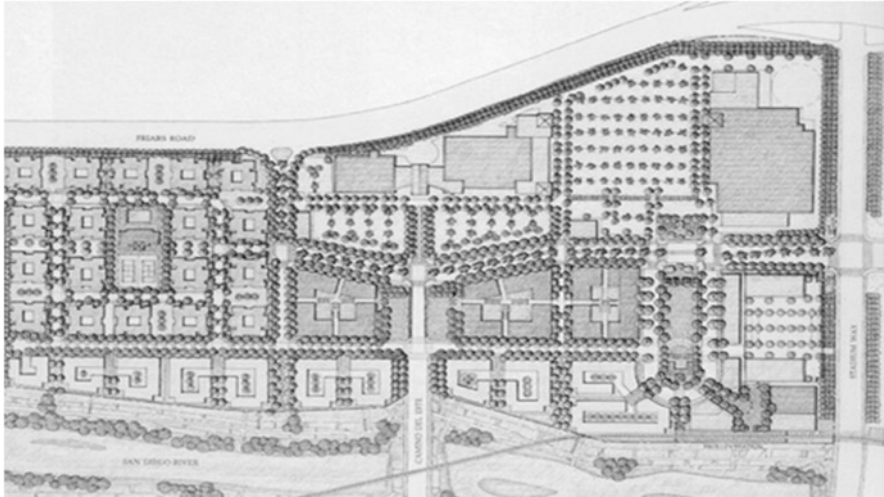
Rio Vista West (San Diego, California) site plan [3]
